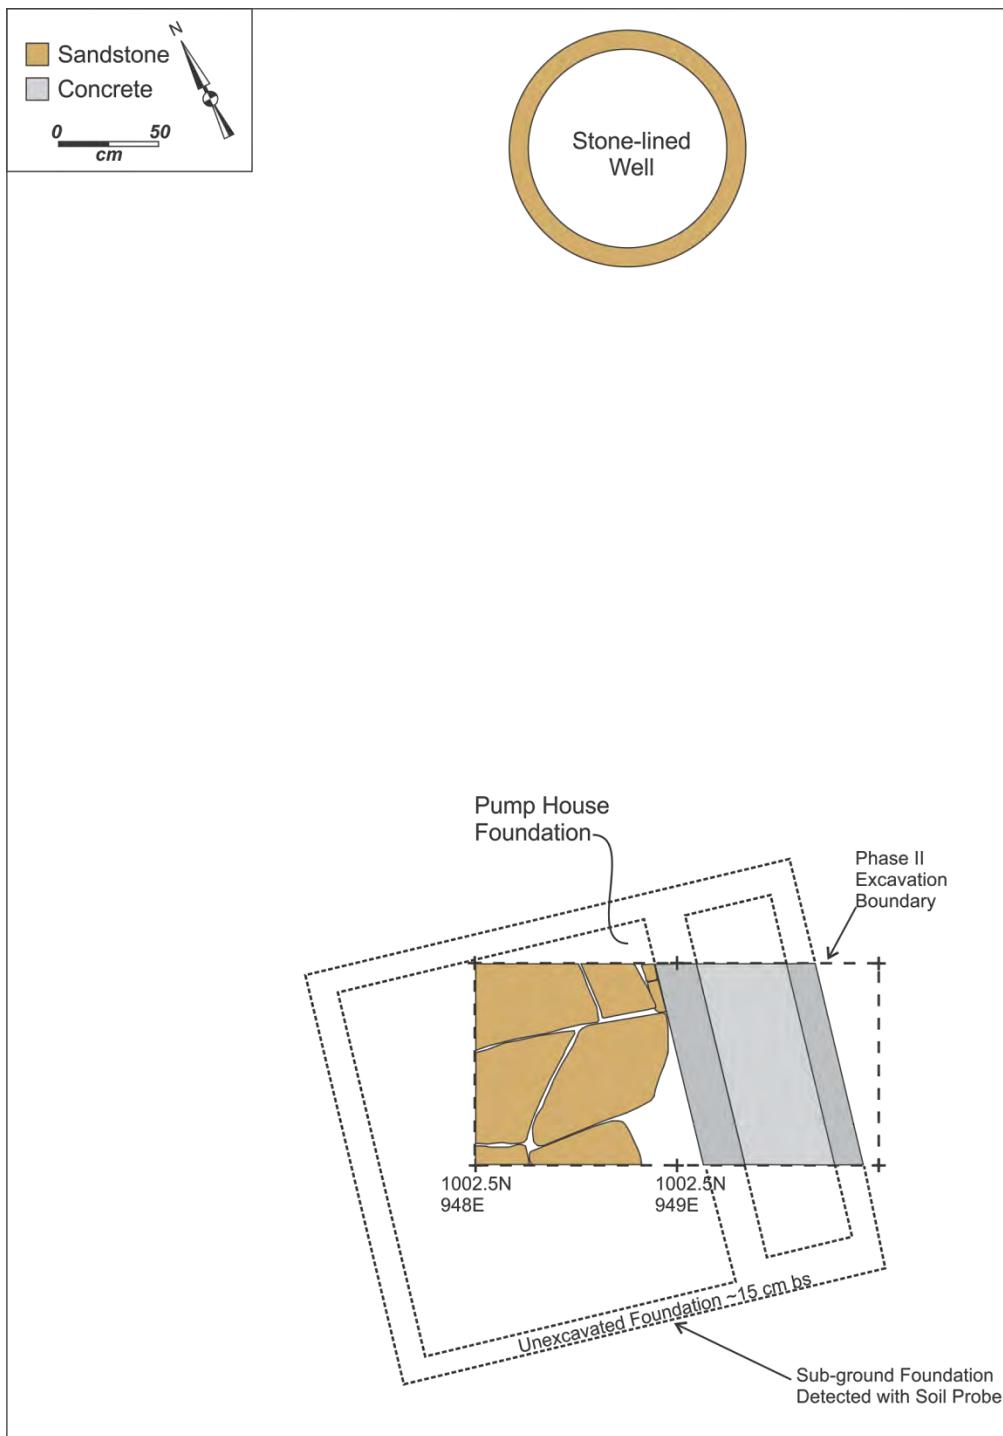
Plan view illustration of a pump house and stone-lined well associated with the house at Stockdale Road Dairy (33Pk217).
